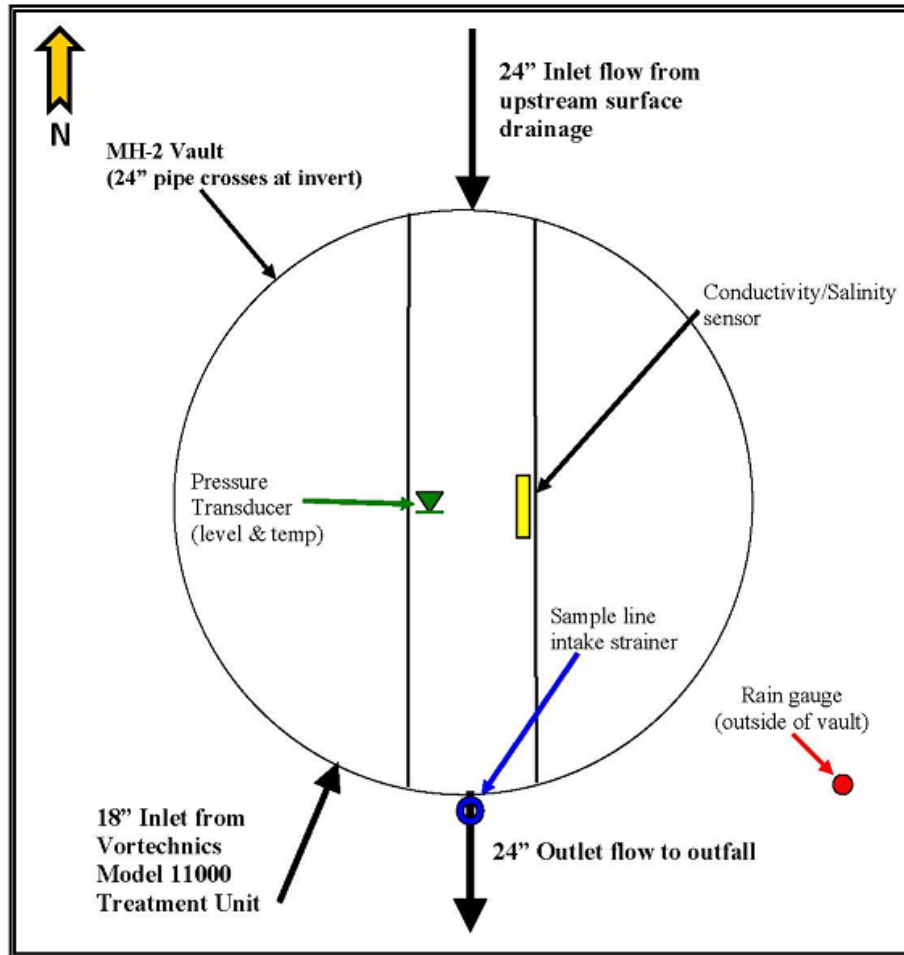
Generalized Diagram of Monitoring Site Equipment Layout
